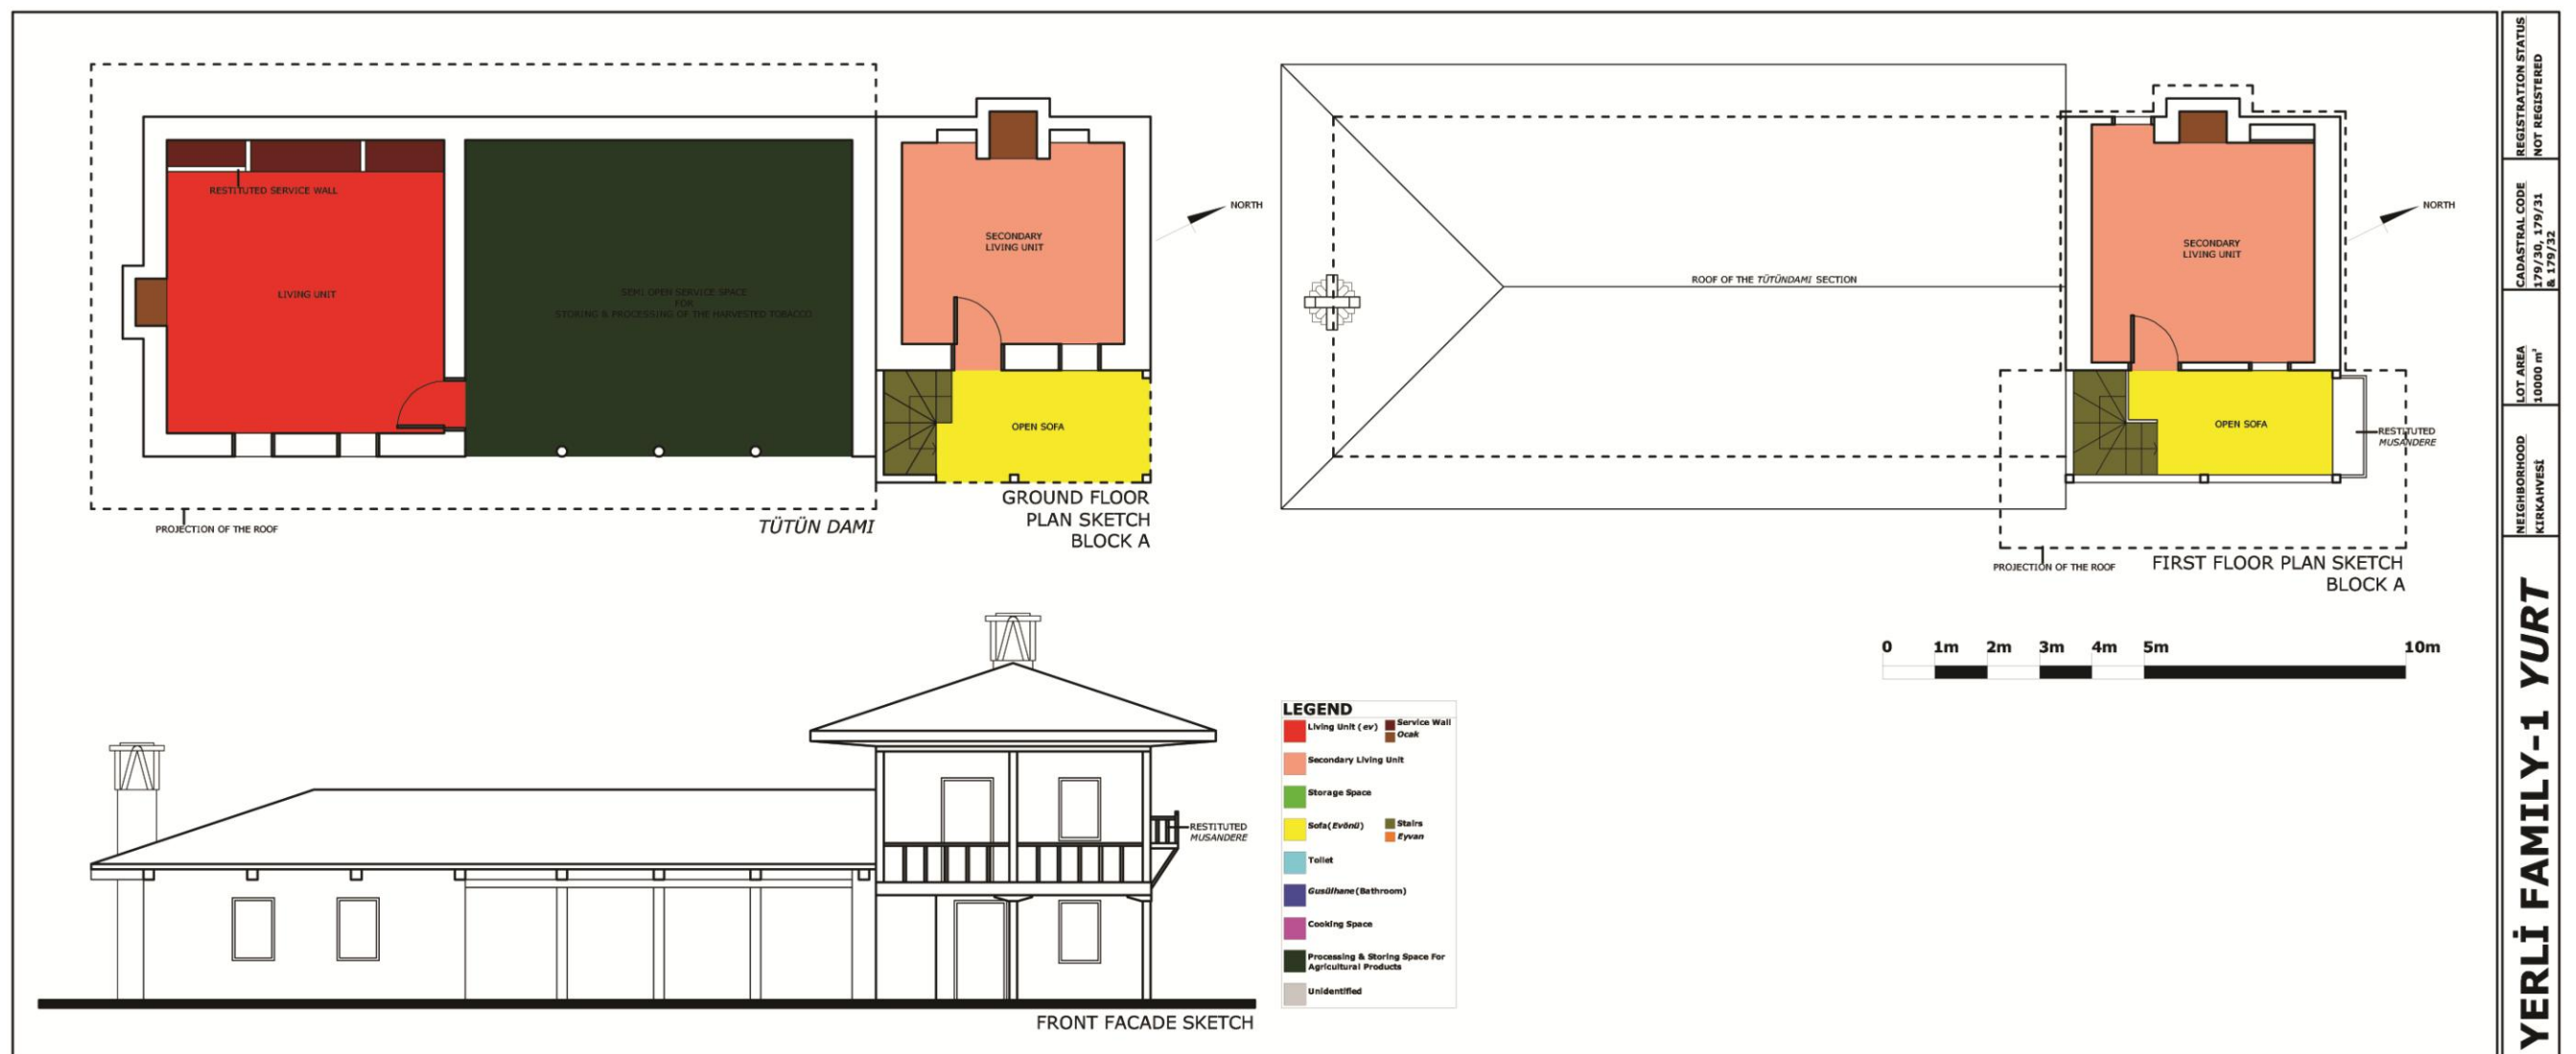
Plan and Front façade sketches of the traditional buildings in the *yurt* of Yerli Family-1
